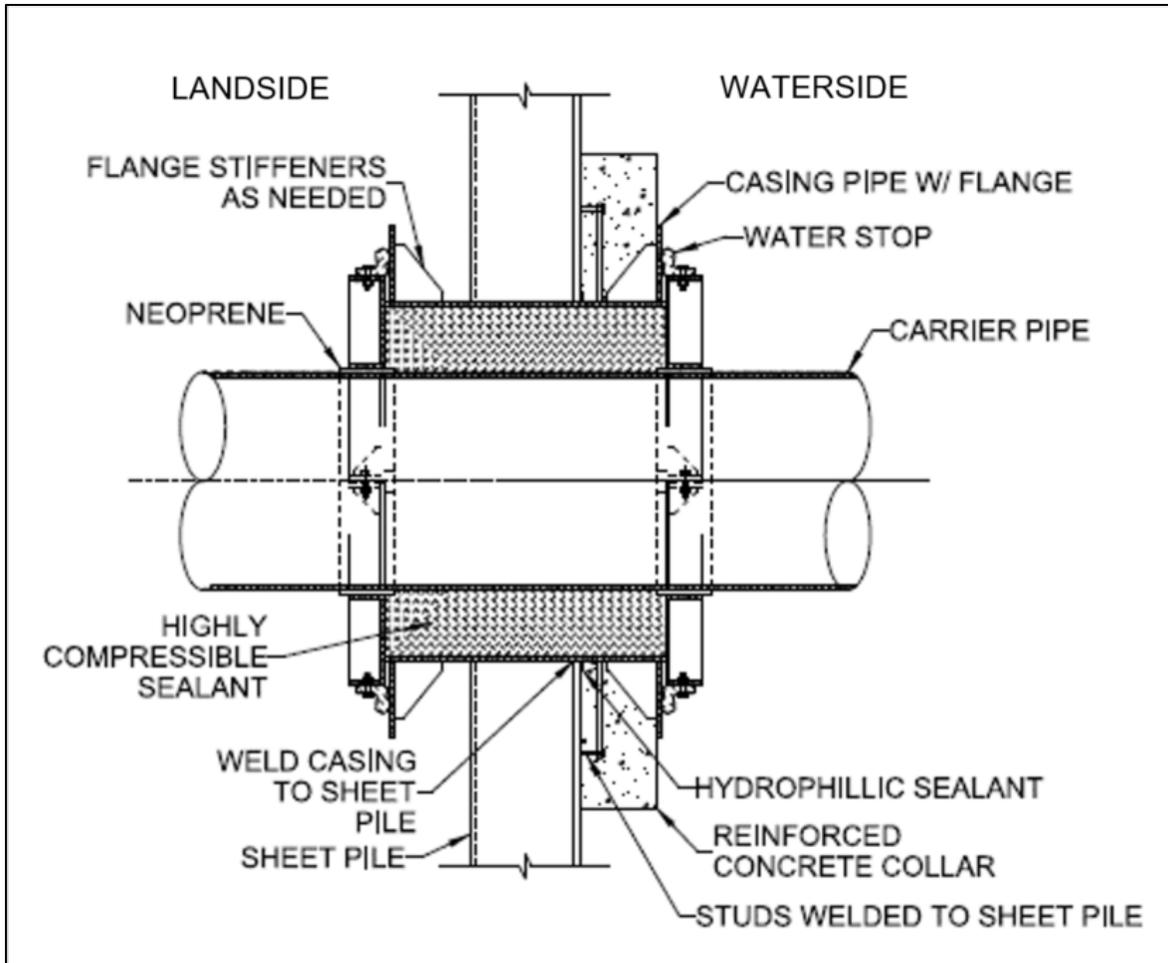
Plan view of concrete collar detail for pipes through sheet piling.
